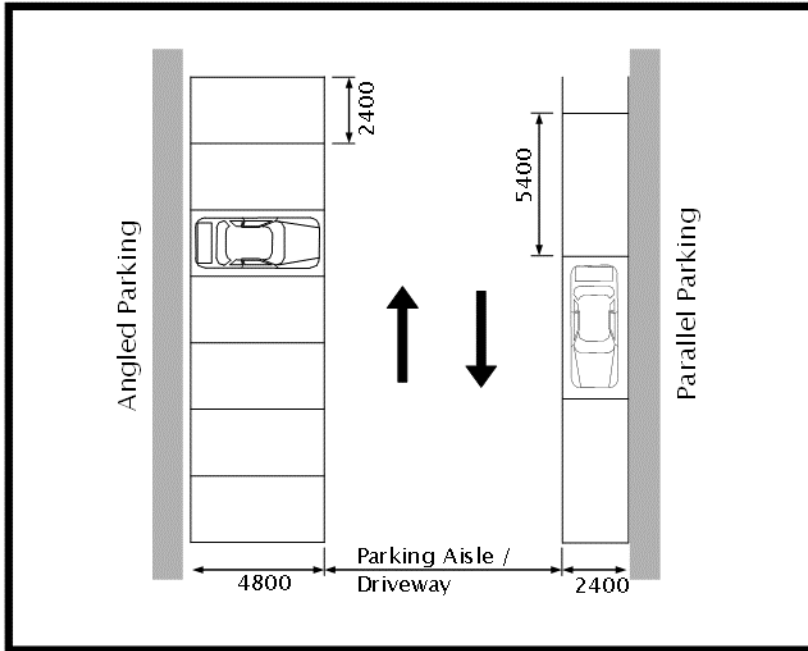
Minimum Dimensions of Car Parking Lots
